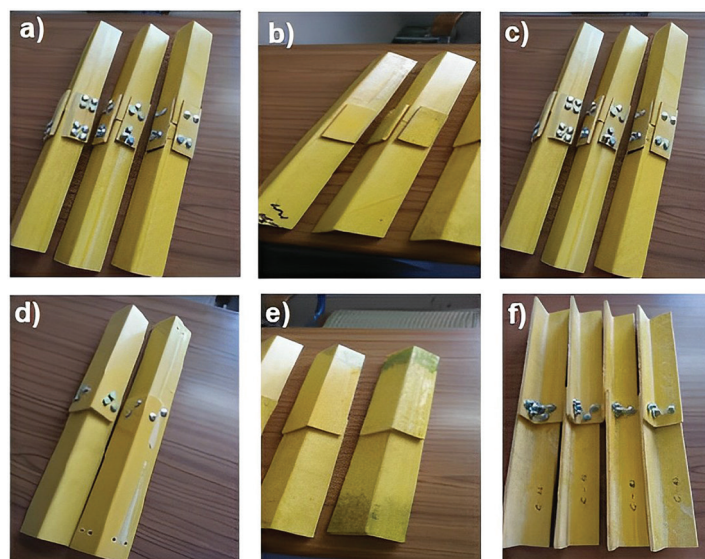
Different combinations of joints and connections of GFRP angle sections a) 2, 3 and 4 bolted butt joint, b) adhesive butt joint, c) hybrid 2, 3 and 4 butt joint, d) 2 and 3 bolted lap joint, e) adhesive lap joint and f) hybrid 2, 3 and 4 lap joint.
